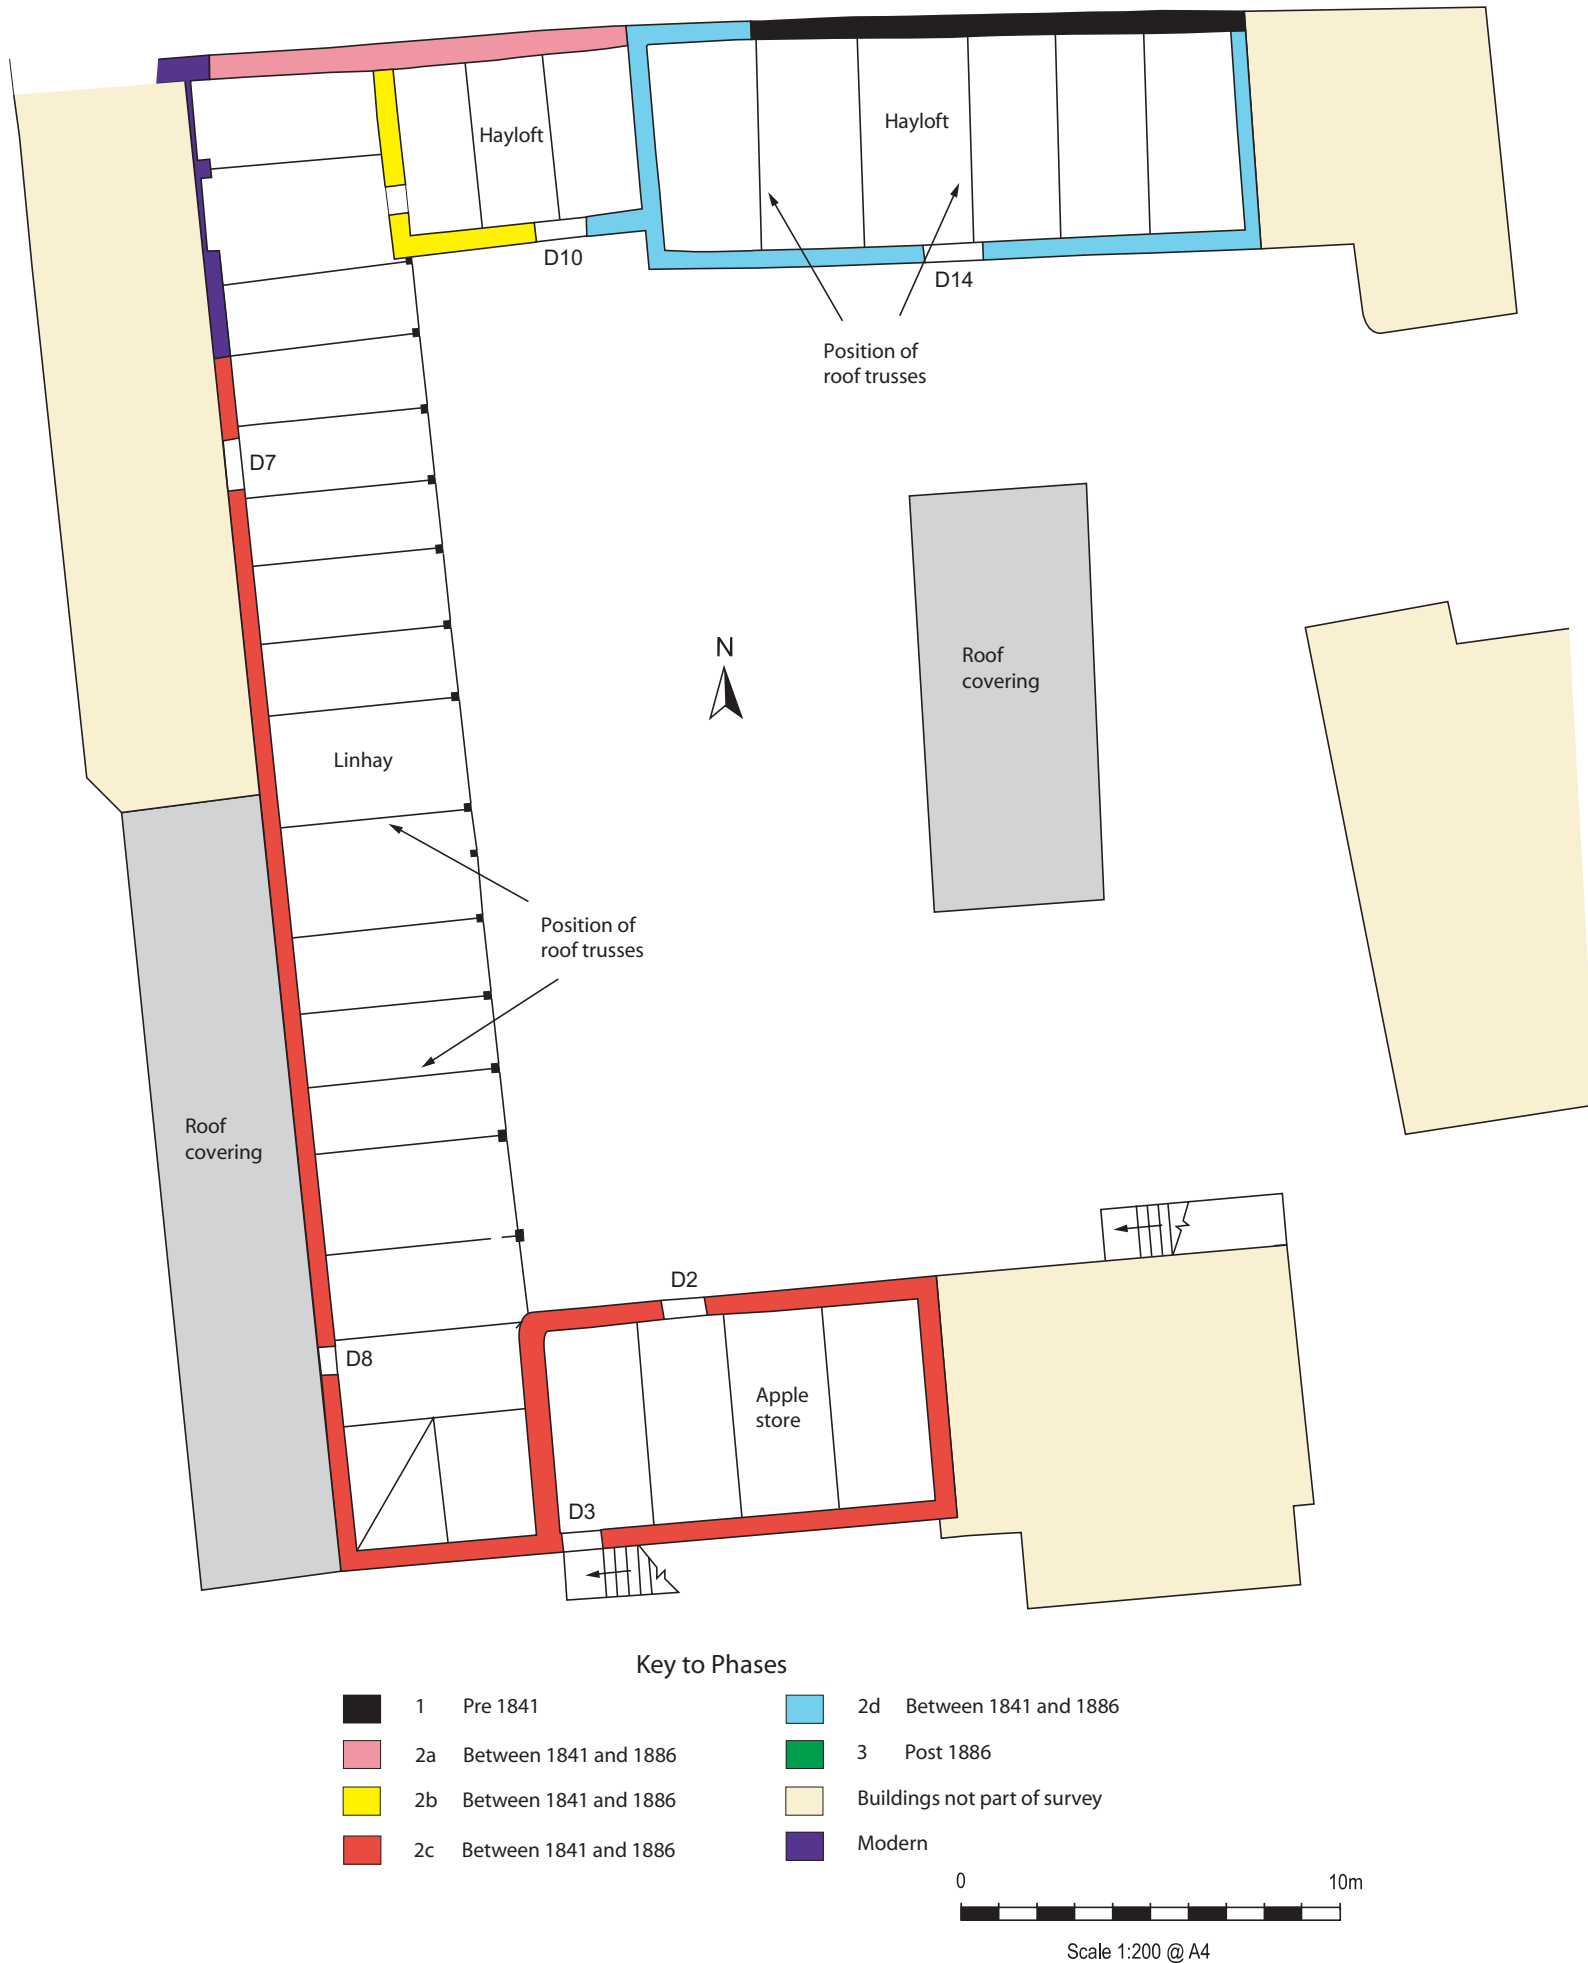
Knowle Farm outbuildings, first floor plan showing building phasing.
